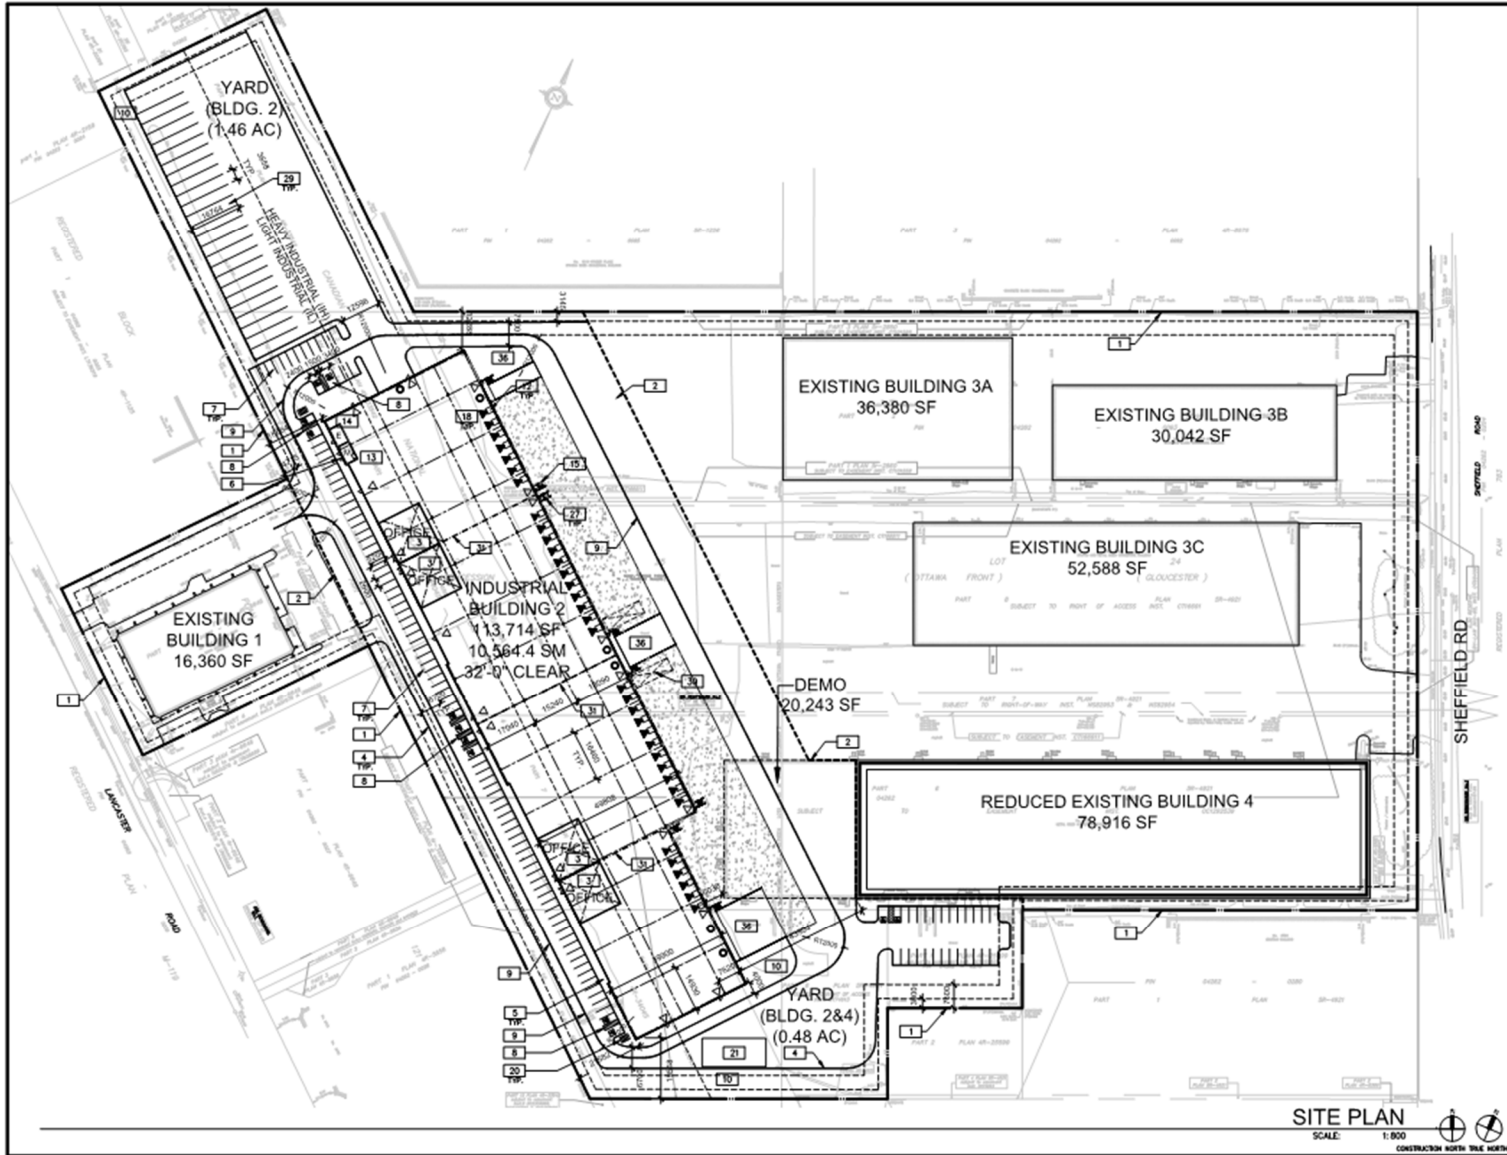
Excerpt of Site Plan by Ware Malcomb dated May 16, 2023
